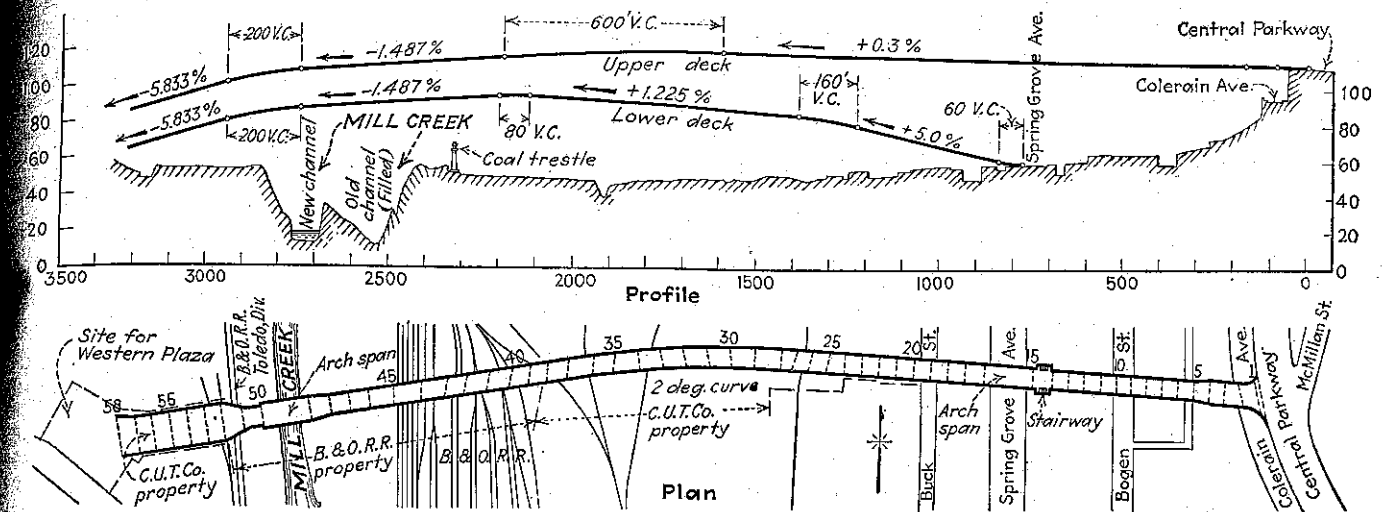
Western Hills viaduct, Cincinnati, a 3,500-ft. double-deck structure built to carry traffic over the new railroad terminal tracks.
